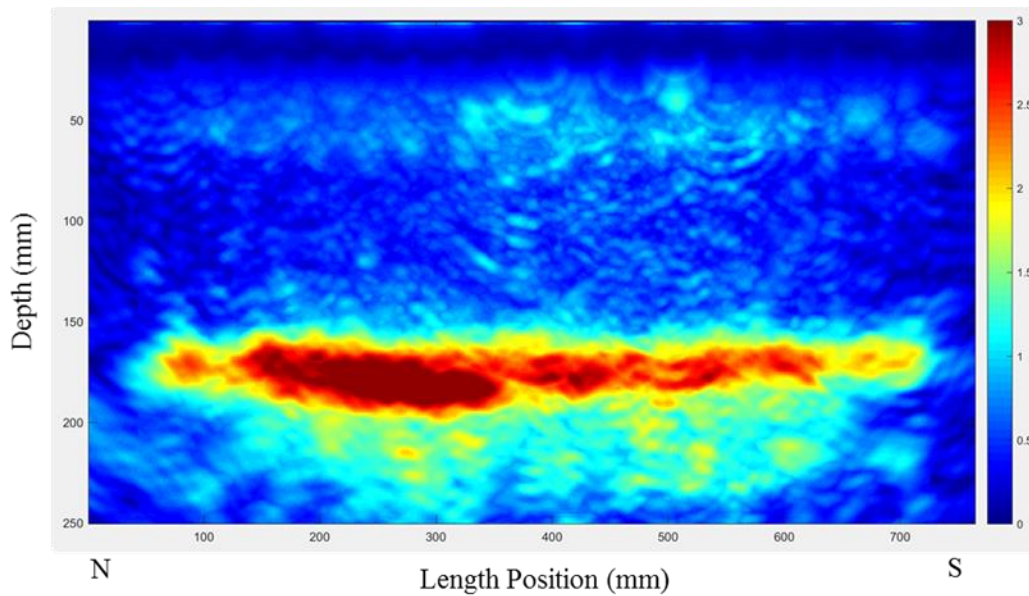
SAFT-Pan Reconstruction of specimen Slab 0, panoramic 5
